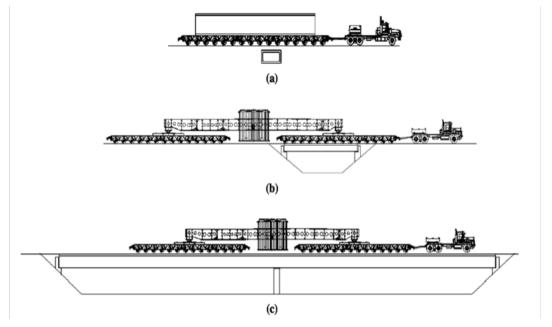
Effect of trailer configuration on structures: (a) culvert crossing, (b) medium-span bridge crossing, and (c) long-span bridge crossing⁶⁸
